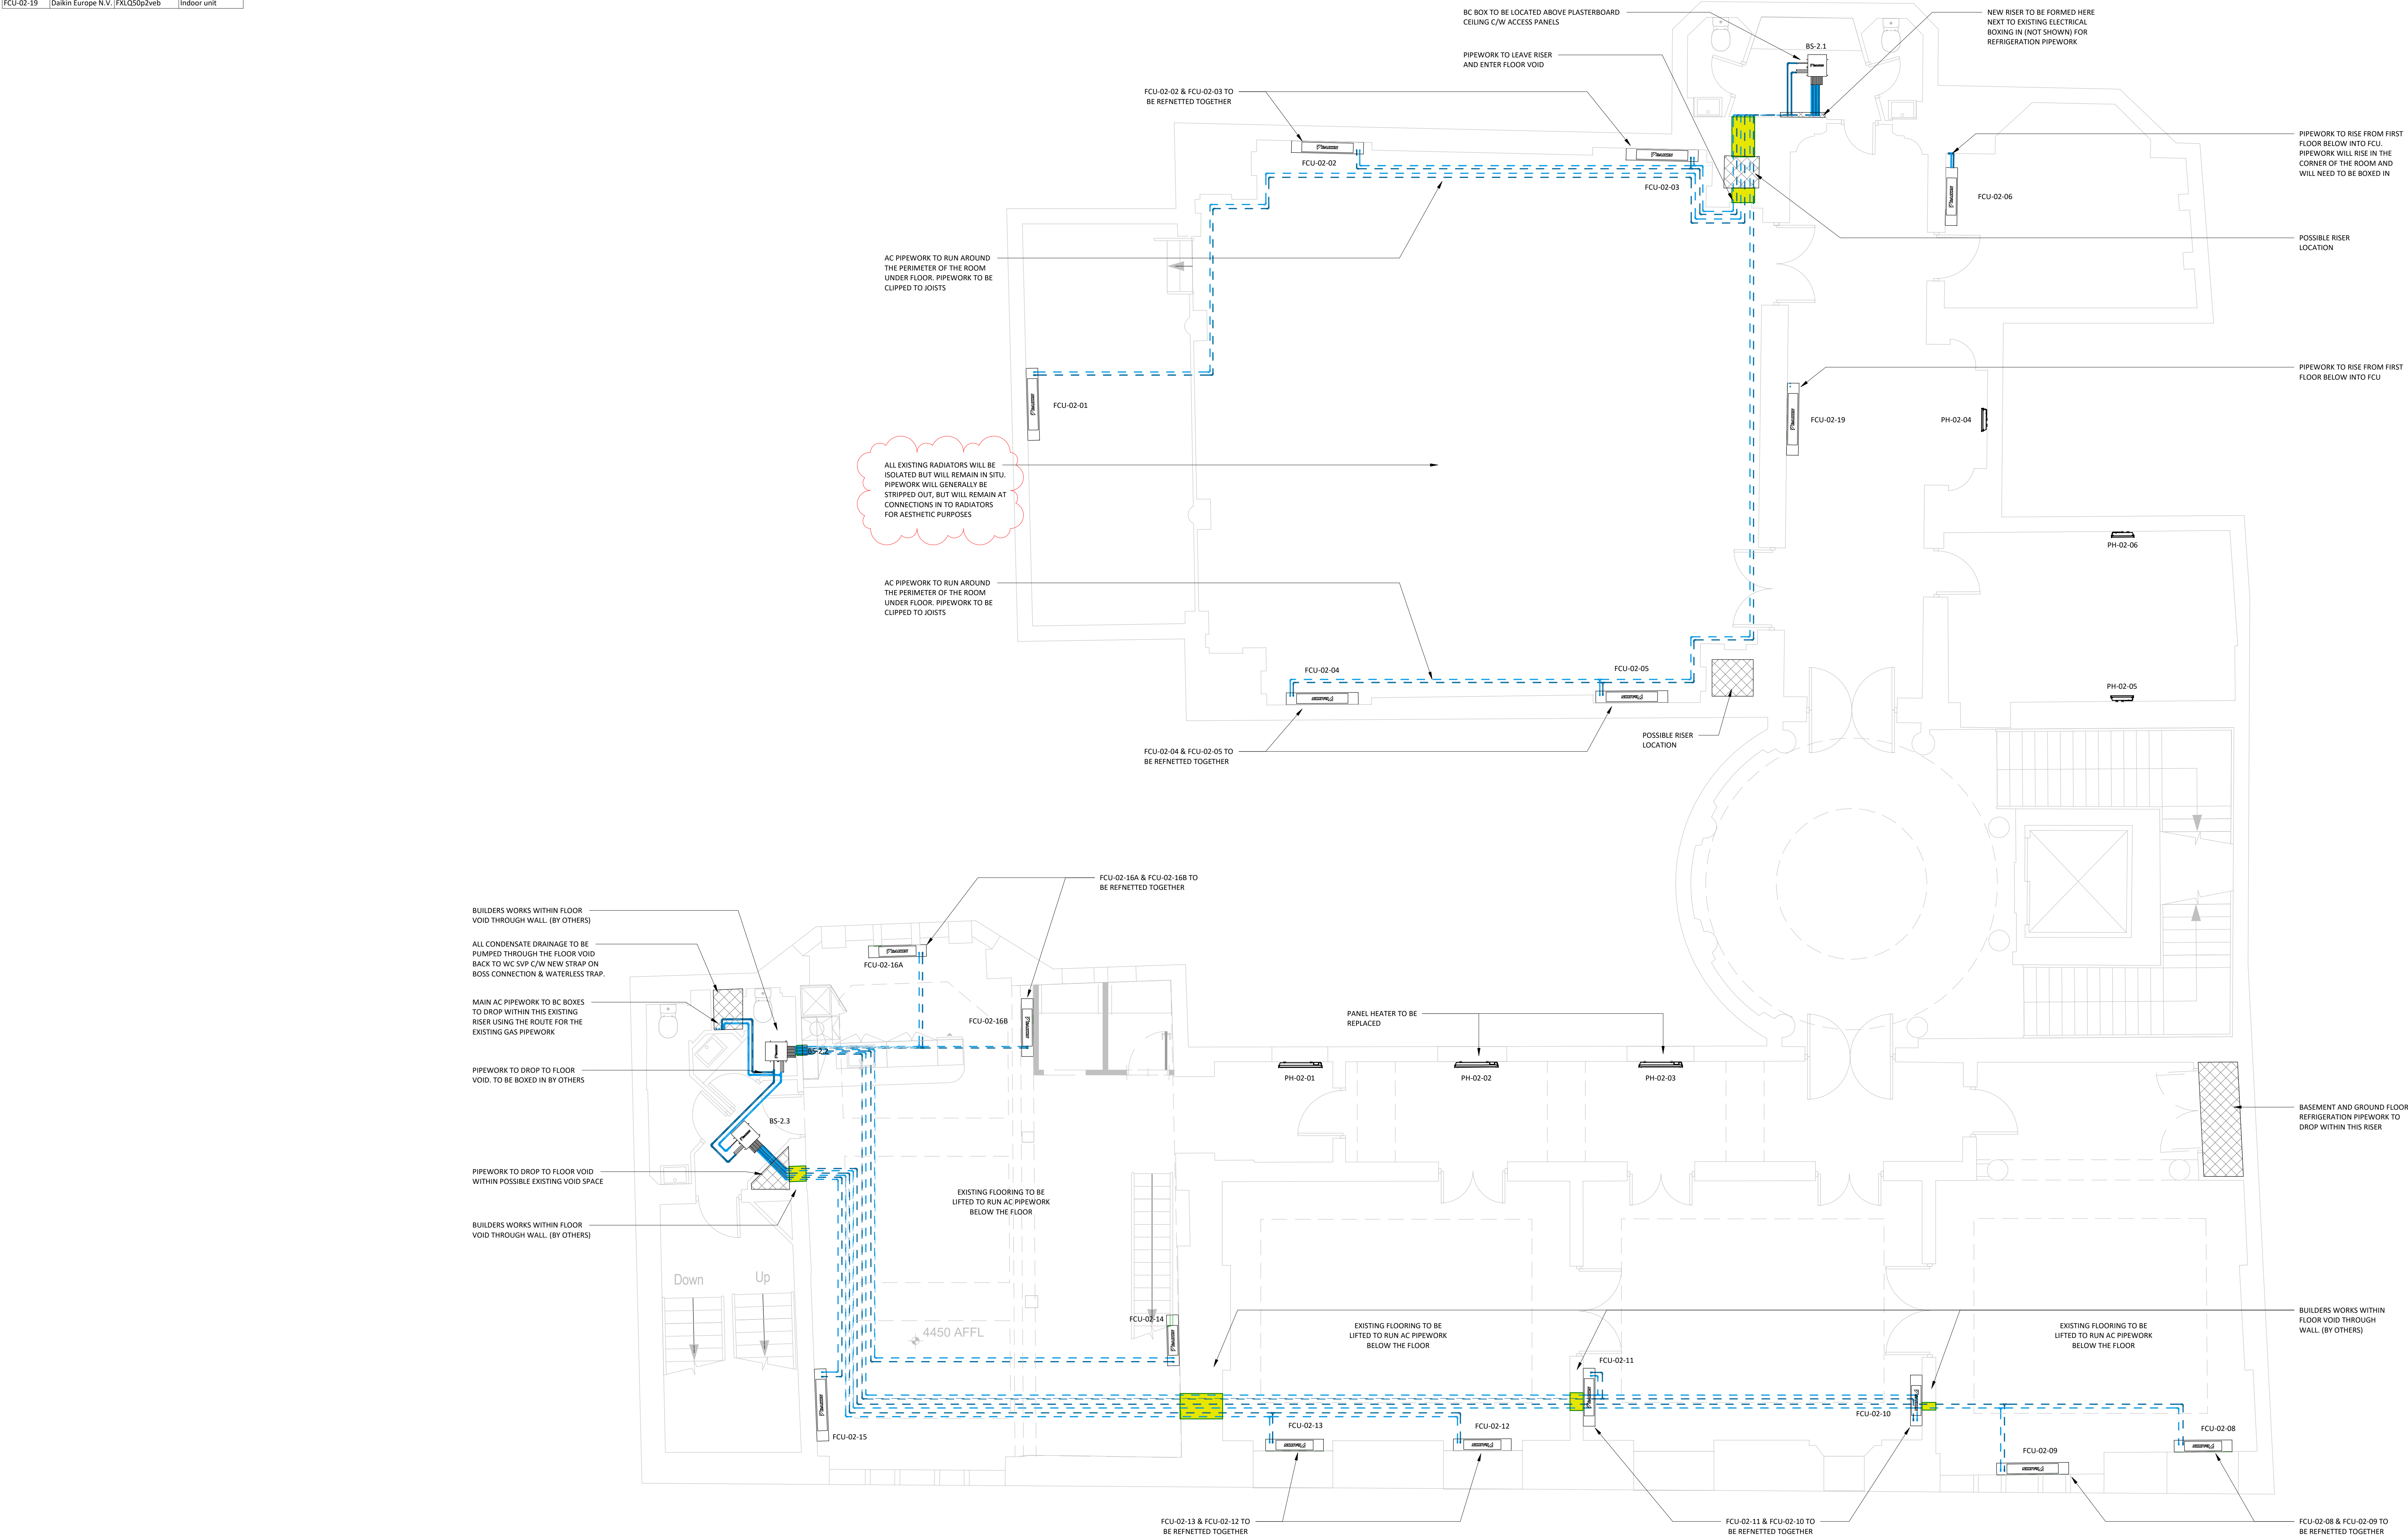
CEL-XX-01-DR-M-5001	Revision P05
